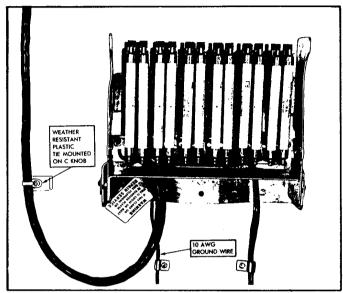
Typical Installation of U-Type Multiple Fuse Protector (Cover Removed)
